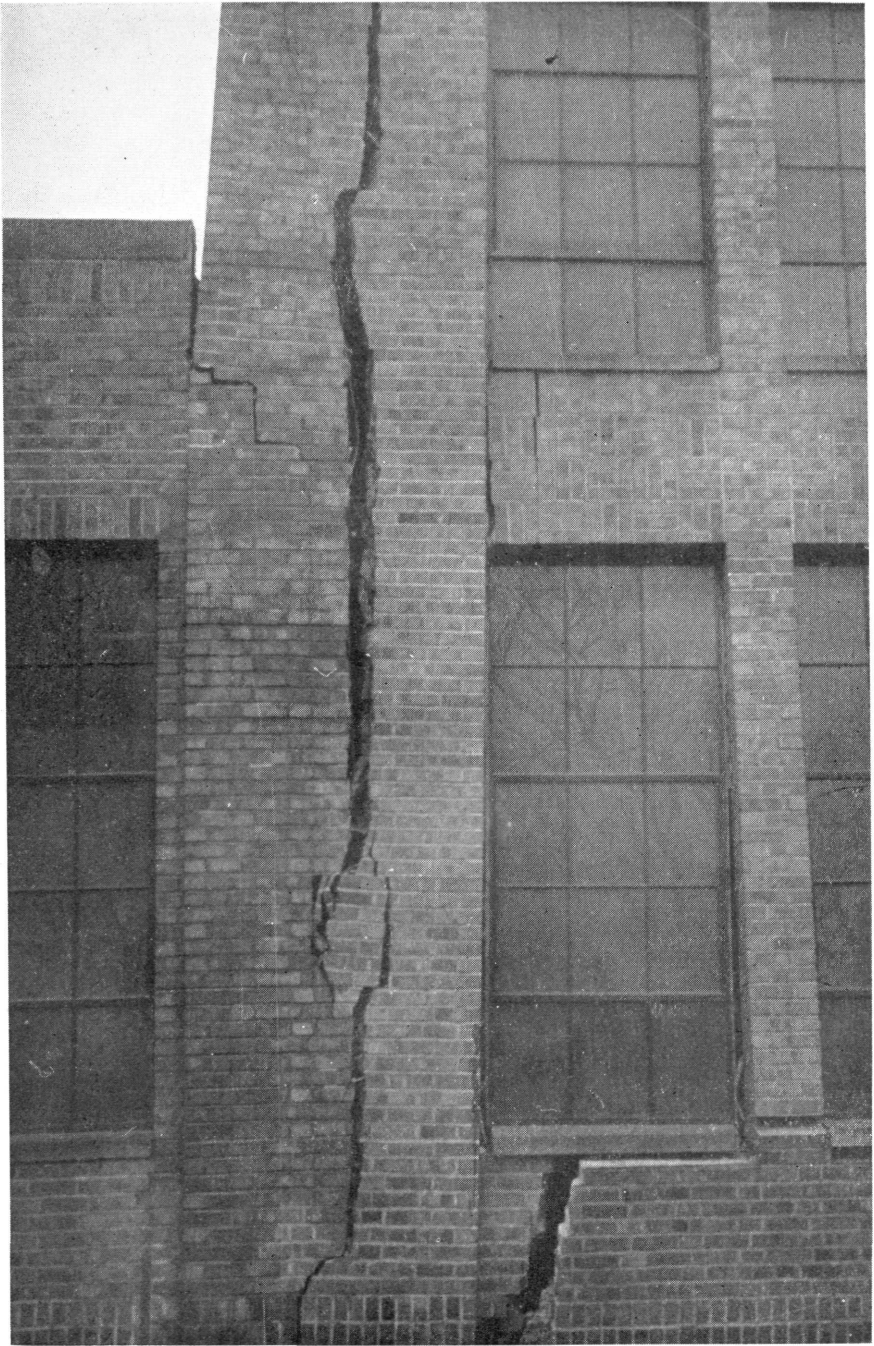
Damaged highway department building. This structure had to be torn down. Brecksville slide.
